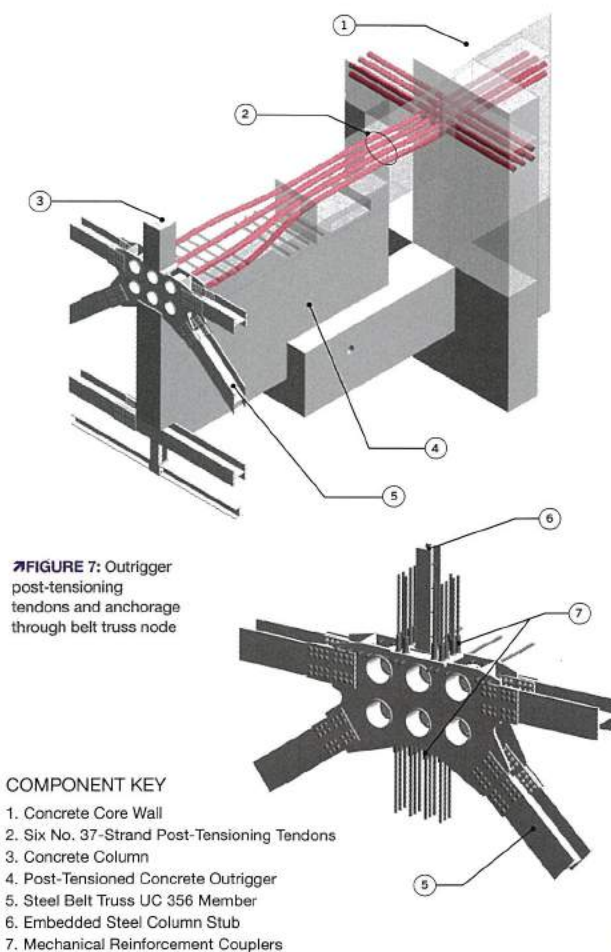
Outrigger post-tensioning tendons and anchorage through belt truss node
